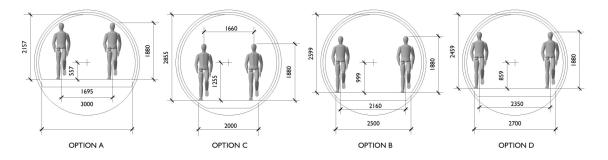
Cross-Section Options for Floor Height, Floor Width and Headroom
